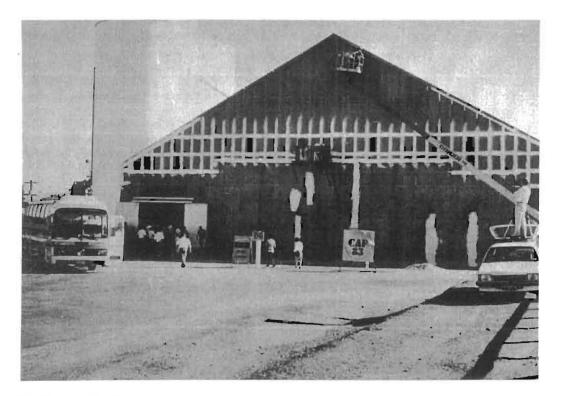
Sealing in progress on the end wall of a horizontal silo at Meckering. Note all lap ends of the corrugated iron sheets used to clad the gable-end wall are individually sealed, as are surface cracks evident in the concrete wall.
